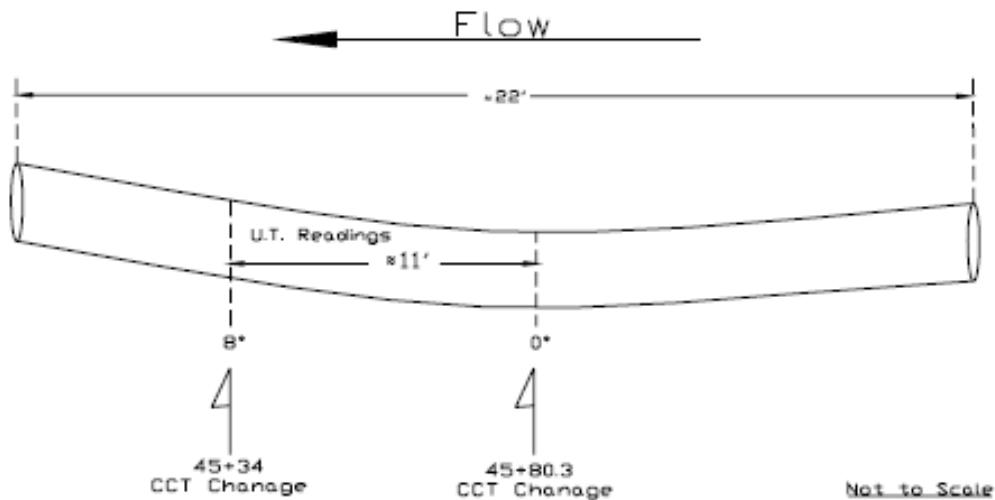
Schematic of Pipe Elevation at DG-ICDA Site 5
